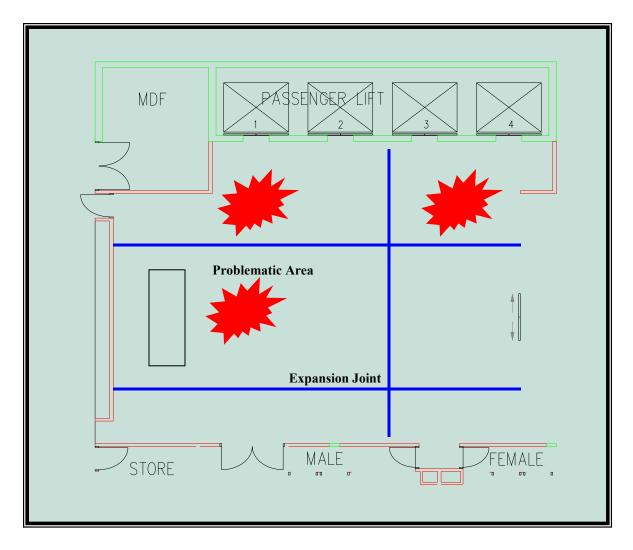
Layout and location of expansion joints and areas of arching and lifting
